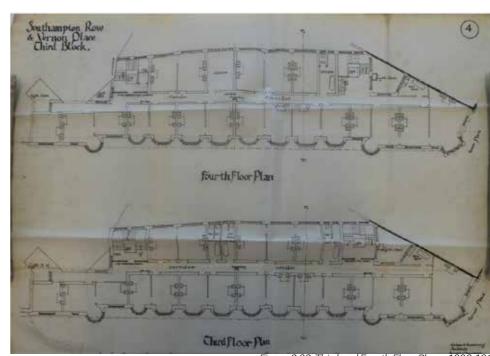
Third and Fourth Floor Plan c.1906-1910
